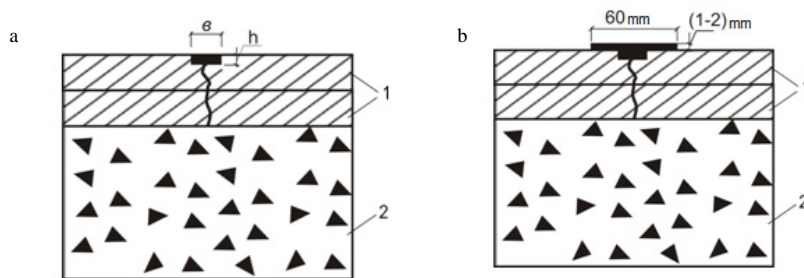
Routed crack filled with bitumen-polymer sealant (a) flush with edges; (b) with overband of sealing material on the surface of asphalt pavement (1 – asphalt concrete layers, 2 – base course).
